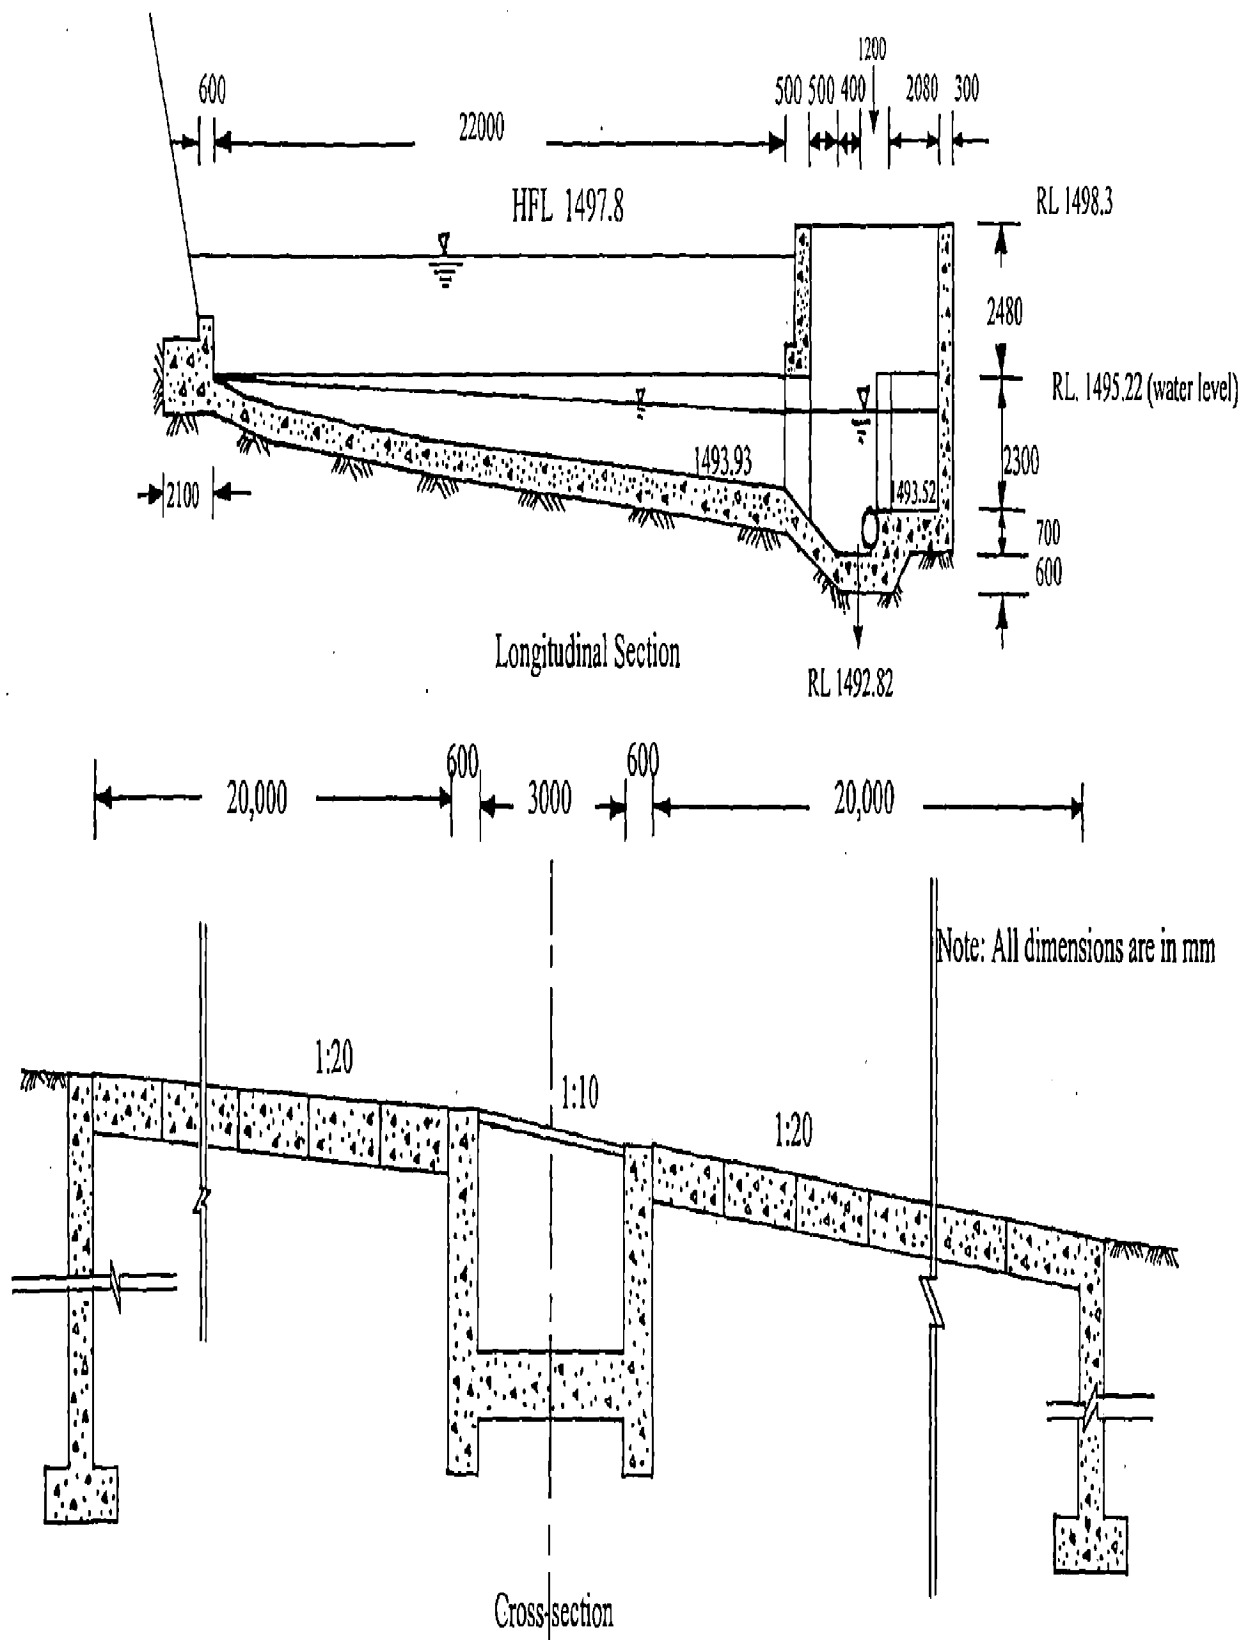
LONGITUDINAL AND CROSS-SECTION OF PROPOSED TRENCH WEIR
